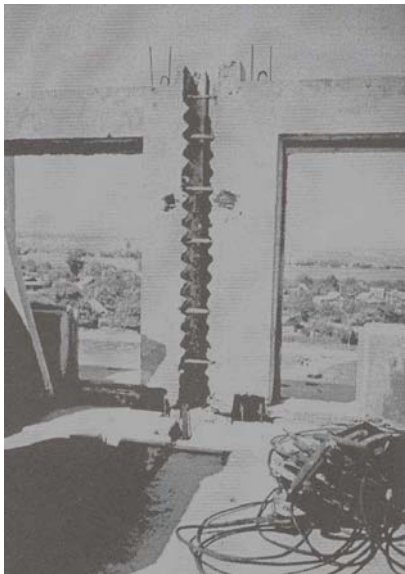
I: Building Under Construction With Exposed Vertical Panel Joint (Source: Imanbekov, Uranova and Iwan, 1999)
